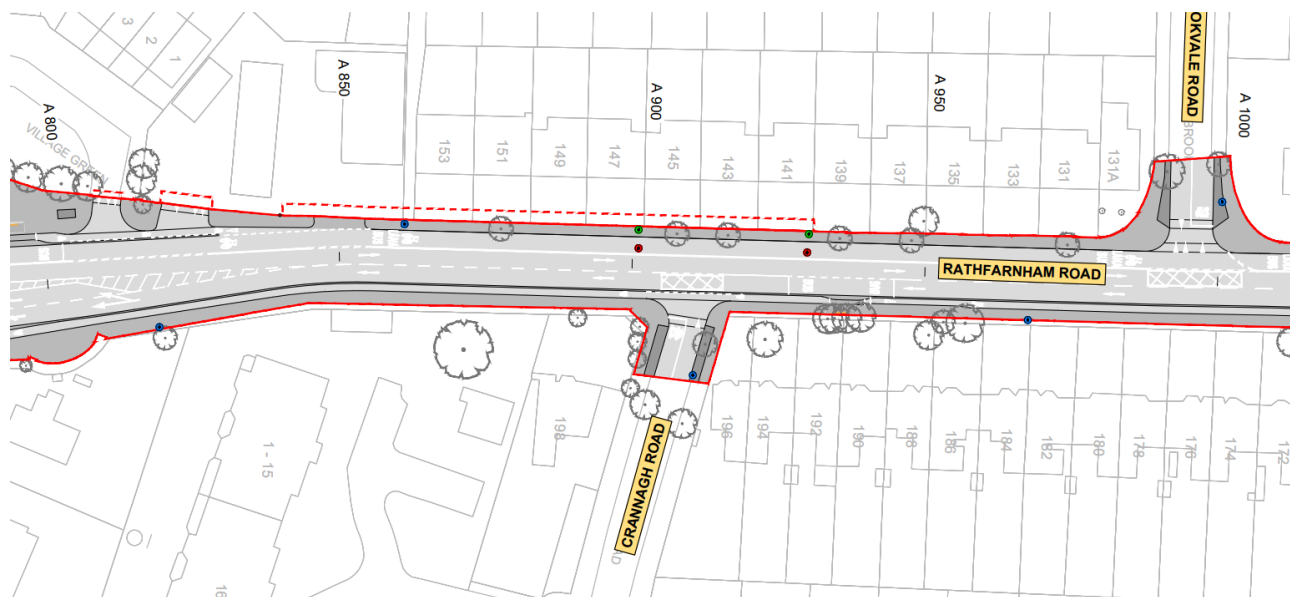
Extract from Street Lighting Drawings at Rathfarnham Road
